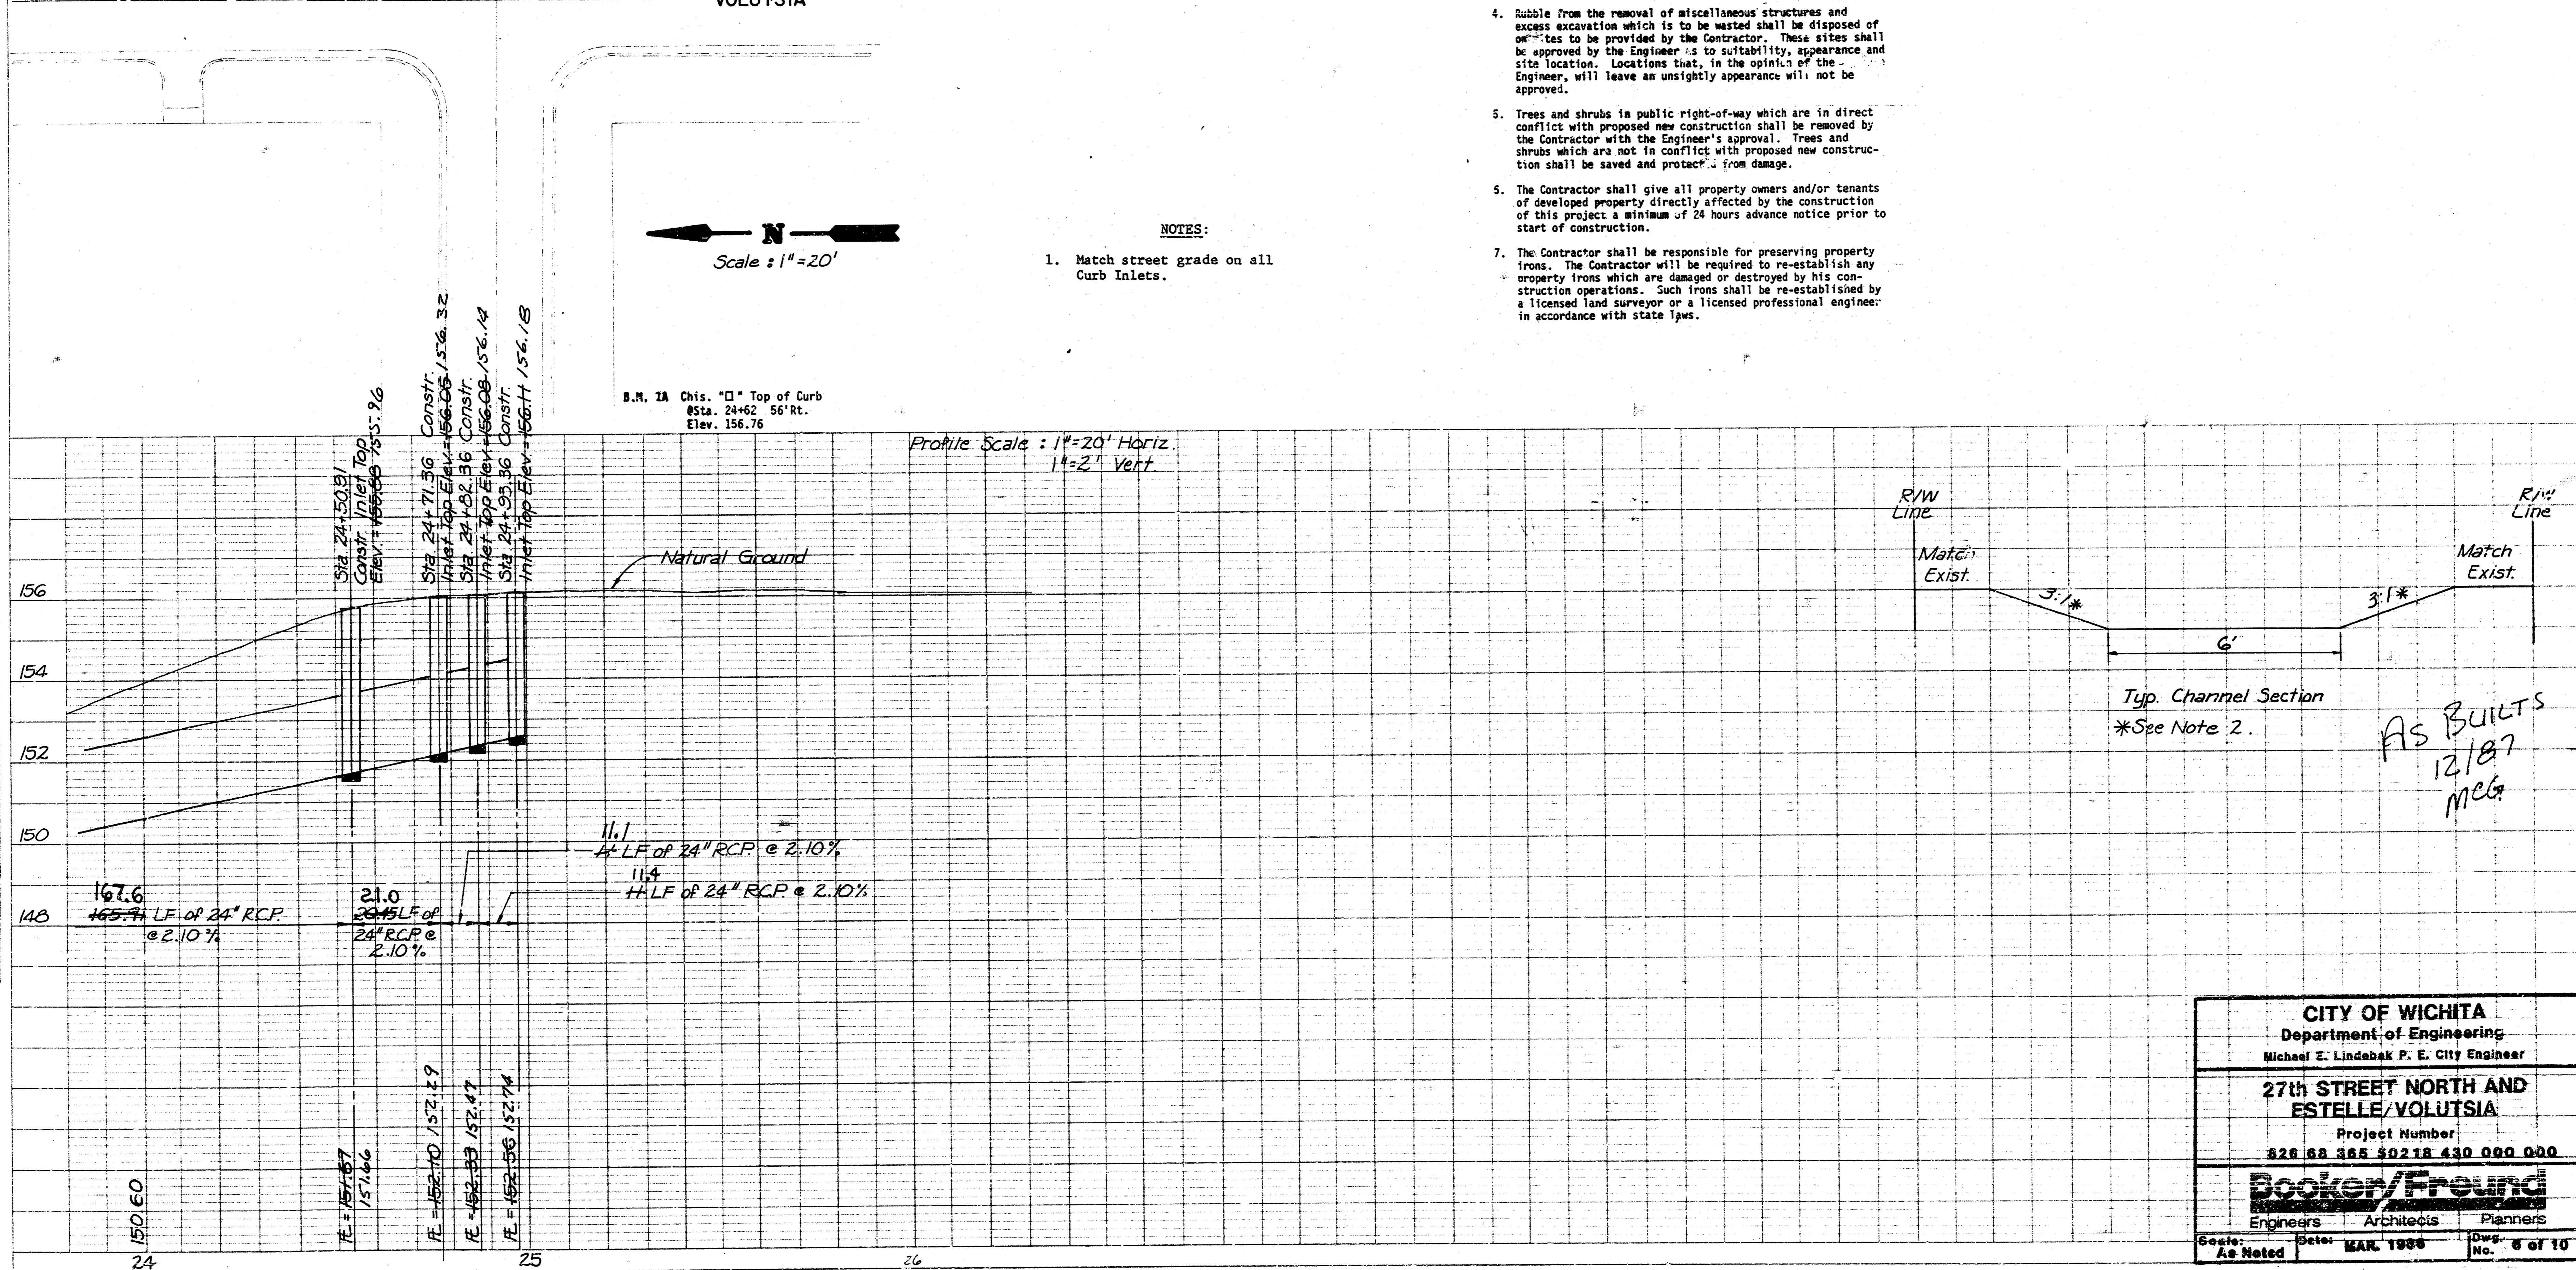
SINGLE PLAN AND PROFILE-FULL LINE
